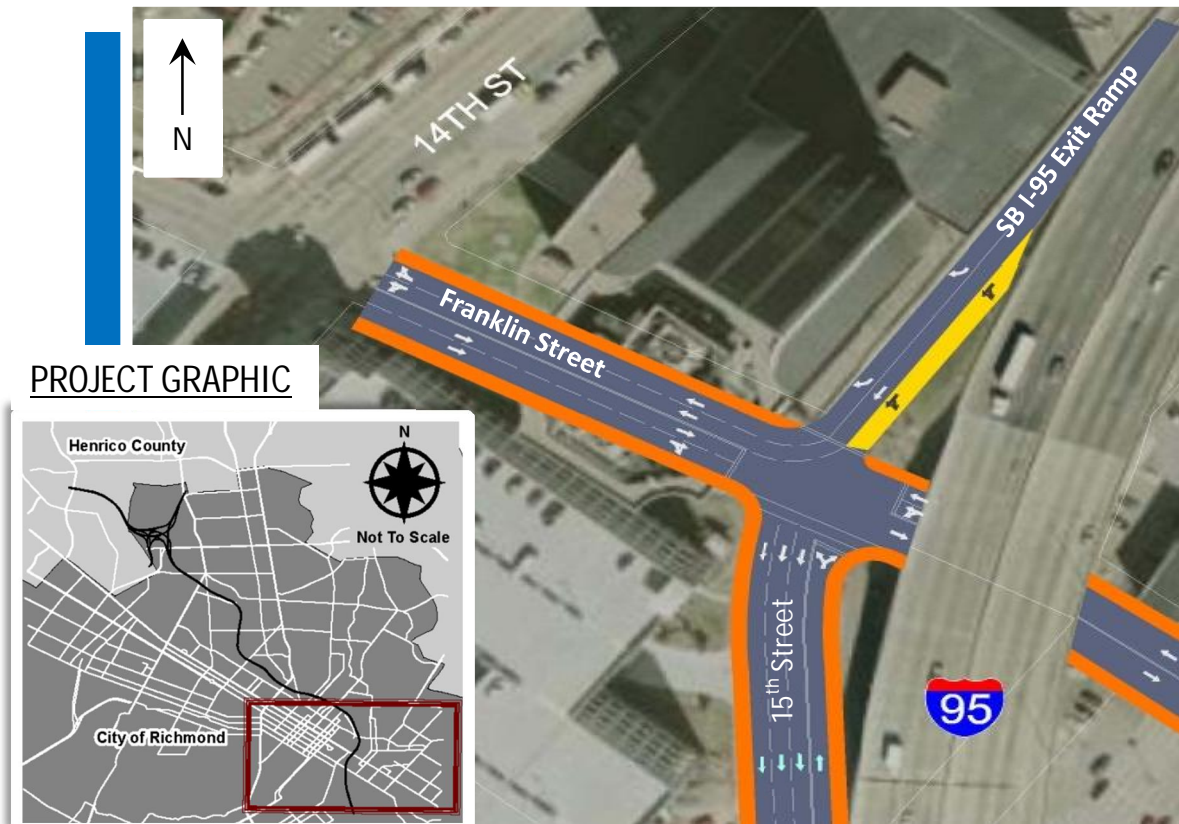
SB I-95 Exit Ramp to Franklin Street/15th Street
